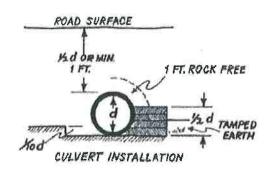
The elements of a properly installed ditch relief culvert. The culvert is angled at about 30 degrees to the road alignment to help capture flow and prevent culvert plugging or erosion of the inlet area. It is set at the base of the fill (ideally) or with a grade slightly steeper than the grade of the contributing ditch (but never with a grade less than 2 percent) (USDA-SCS, 1983). At a minimum, the grade of the ditch relief culvert should be sufficient to prevent sediment accumulation at the inlet or deposition within the culvert itself (it should be self-cleaning) (USDA-SCS, 1983).
